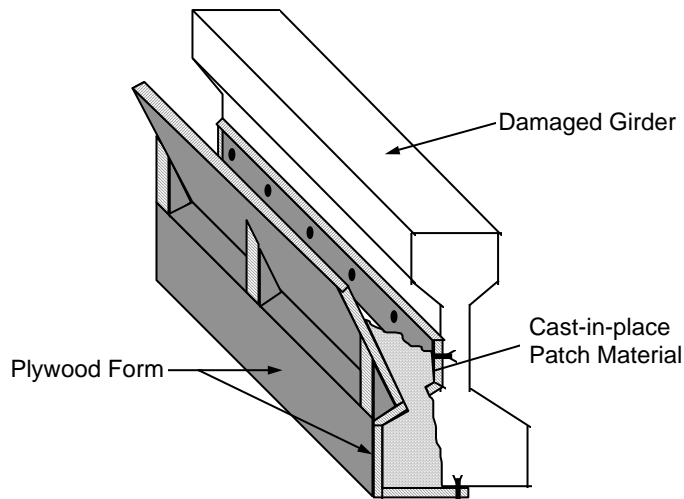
Cast-in-place repair of impact-damaged concrete girder
